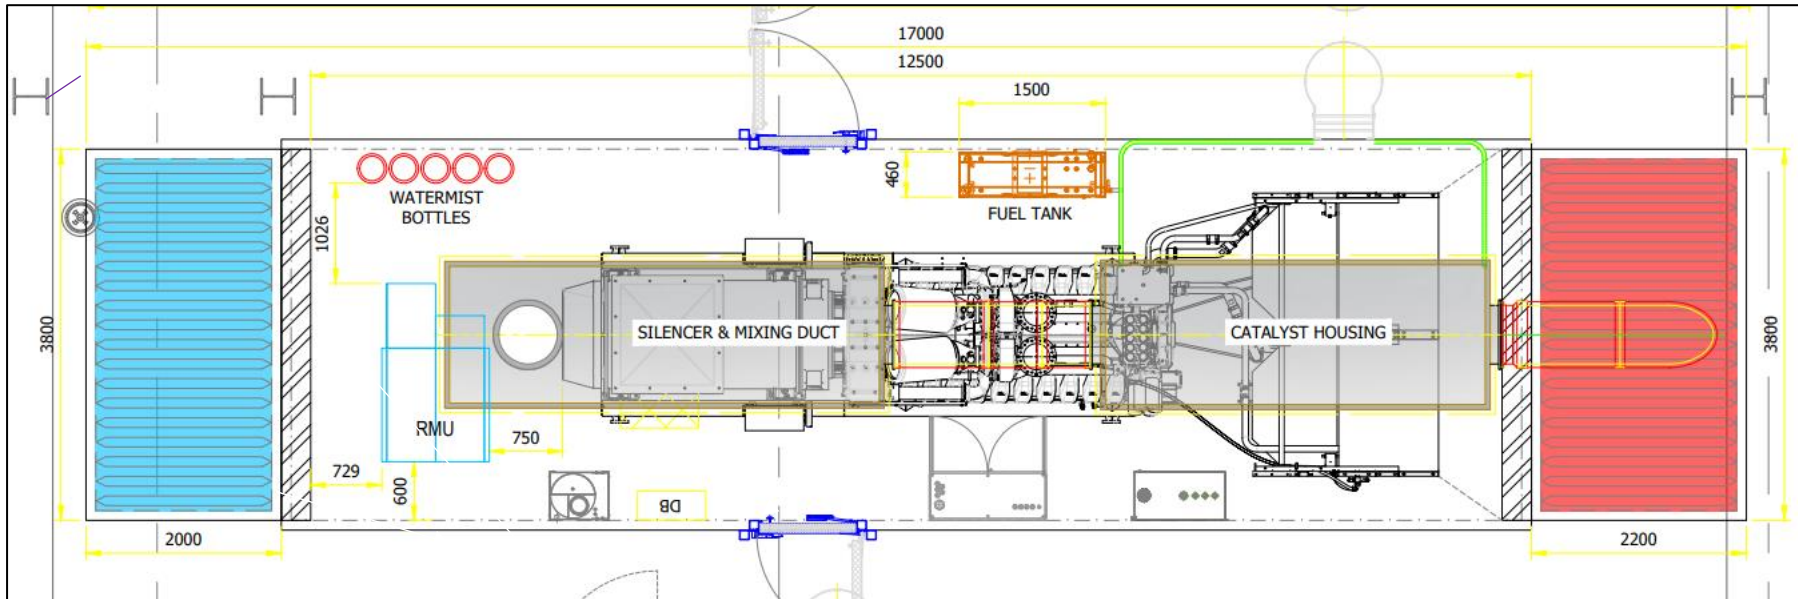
TYPICAL LAYOUT OF GENERATOR INSIDE CONTAINERS
